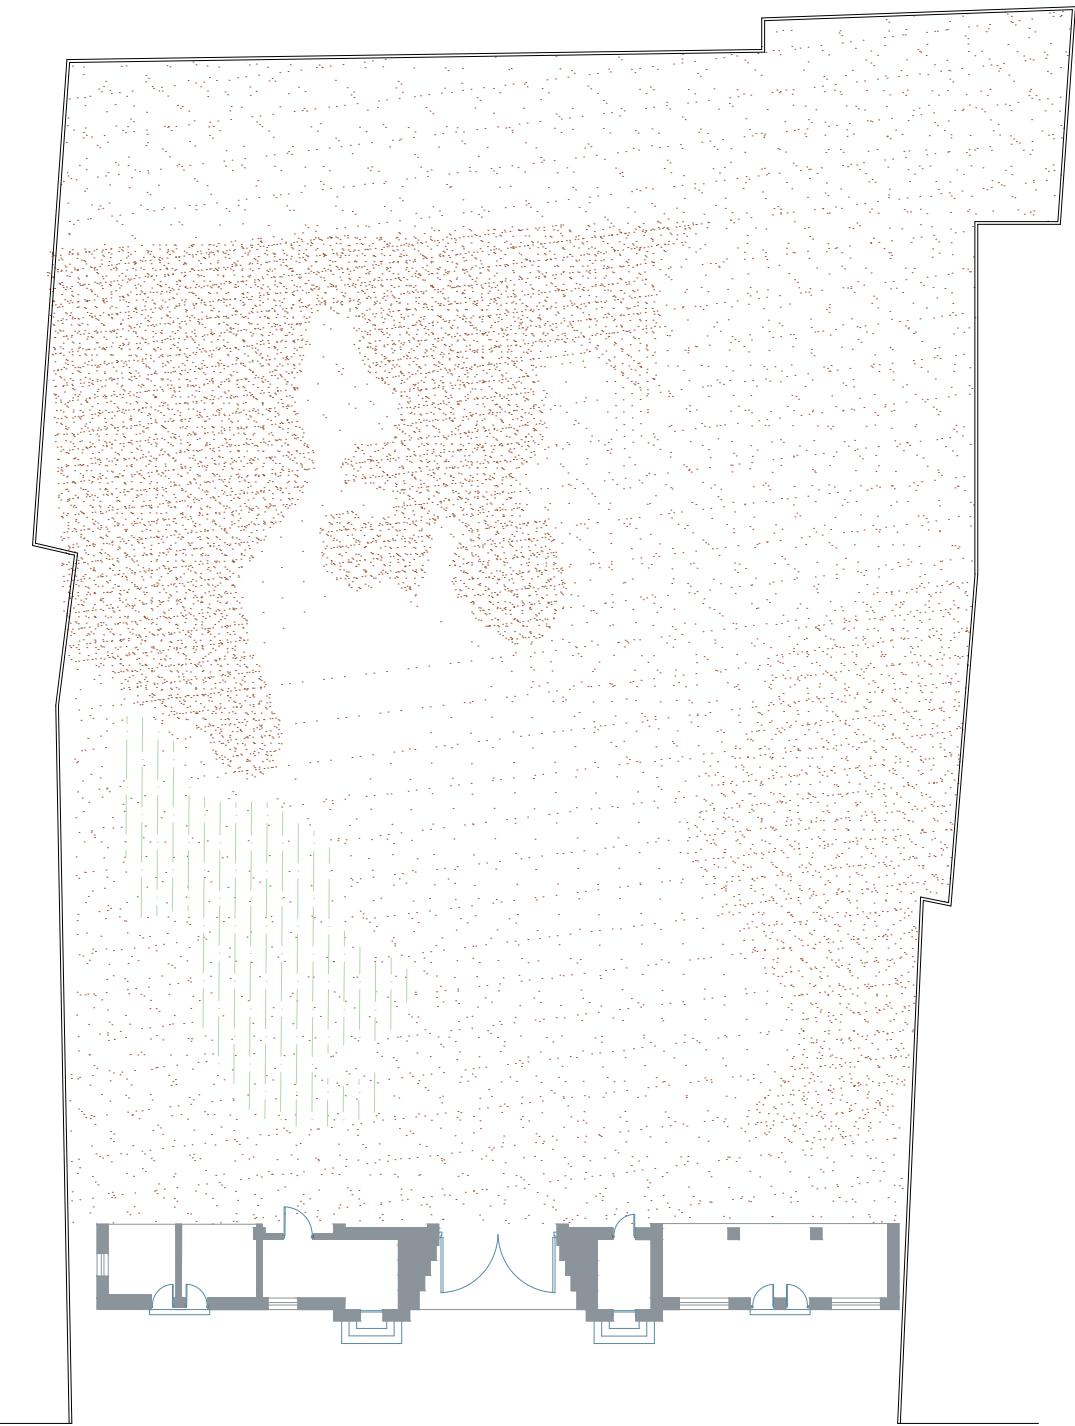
LAKSHMI BUILDING - DEMOLISHED GROUND FLOOR PLAN – 2008, from Punjab Archaeology Department.
